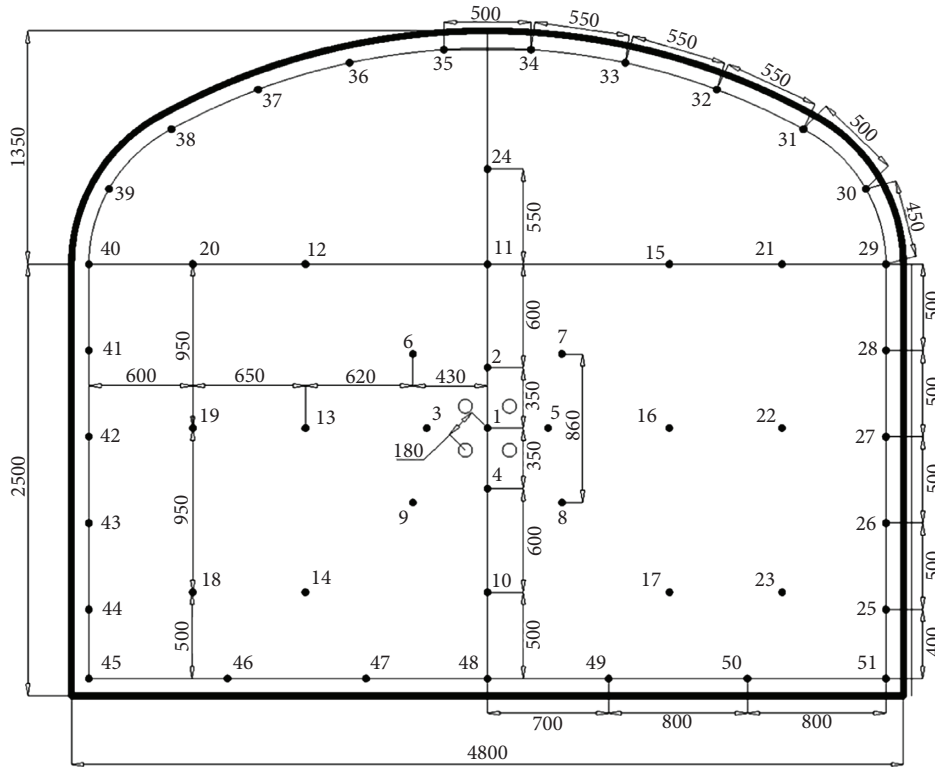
Blast hole layout of the Xingshan iron mine roadway (mm).
